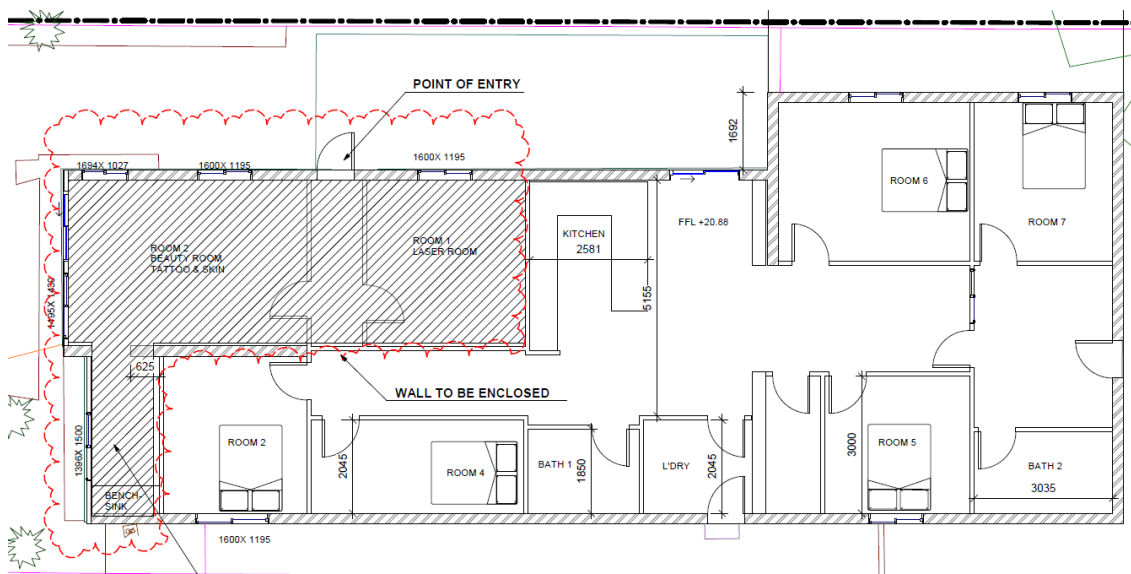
Proposed floor plan (source: AKT Engineering & Consulting).
